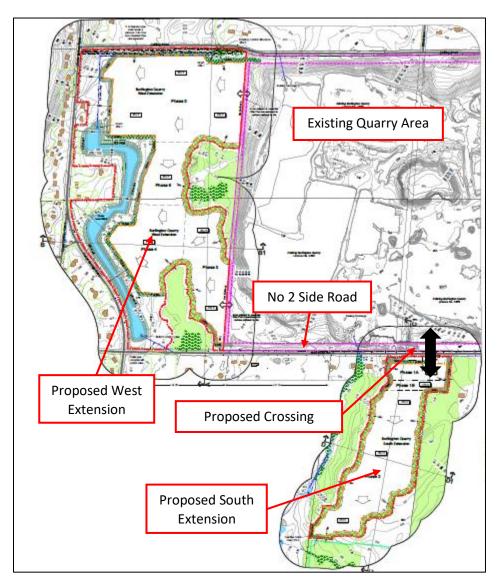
Site plan showing the existing quarry and proposed extensions and crossing (MHBC)<sup>2</sup>.
